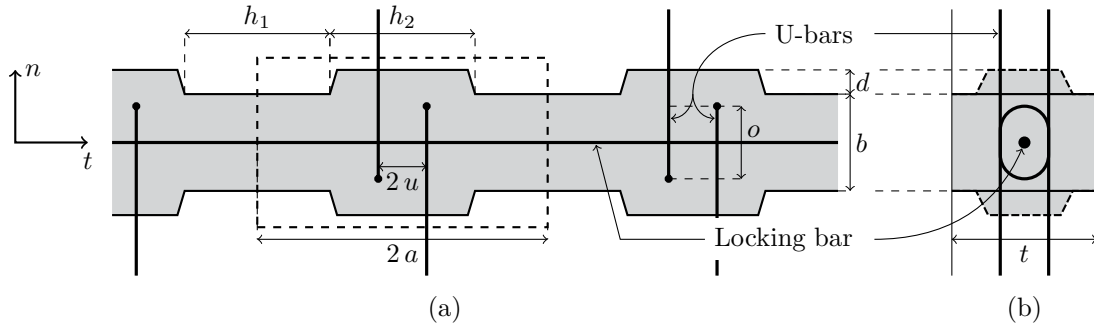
The basic design of a keyed joint reinforced with U-bars: a) elevation, b) cross section.
